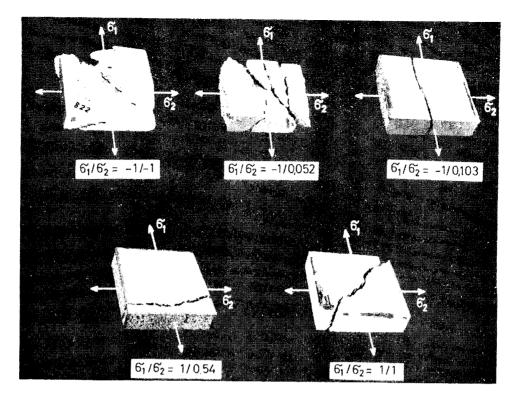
Failure modes of specimens subjected to biaxial stresses
